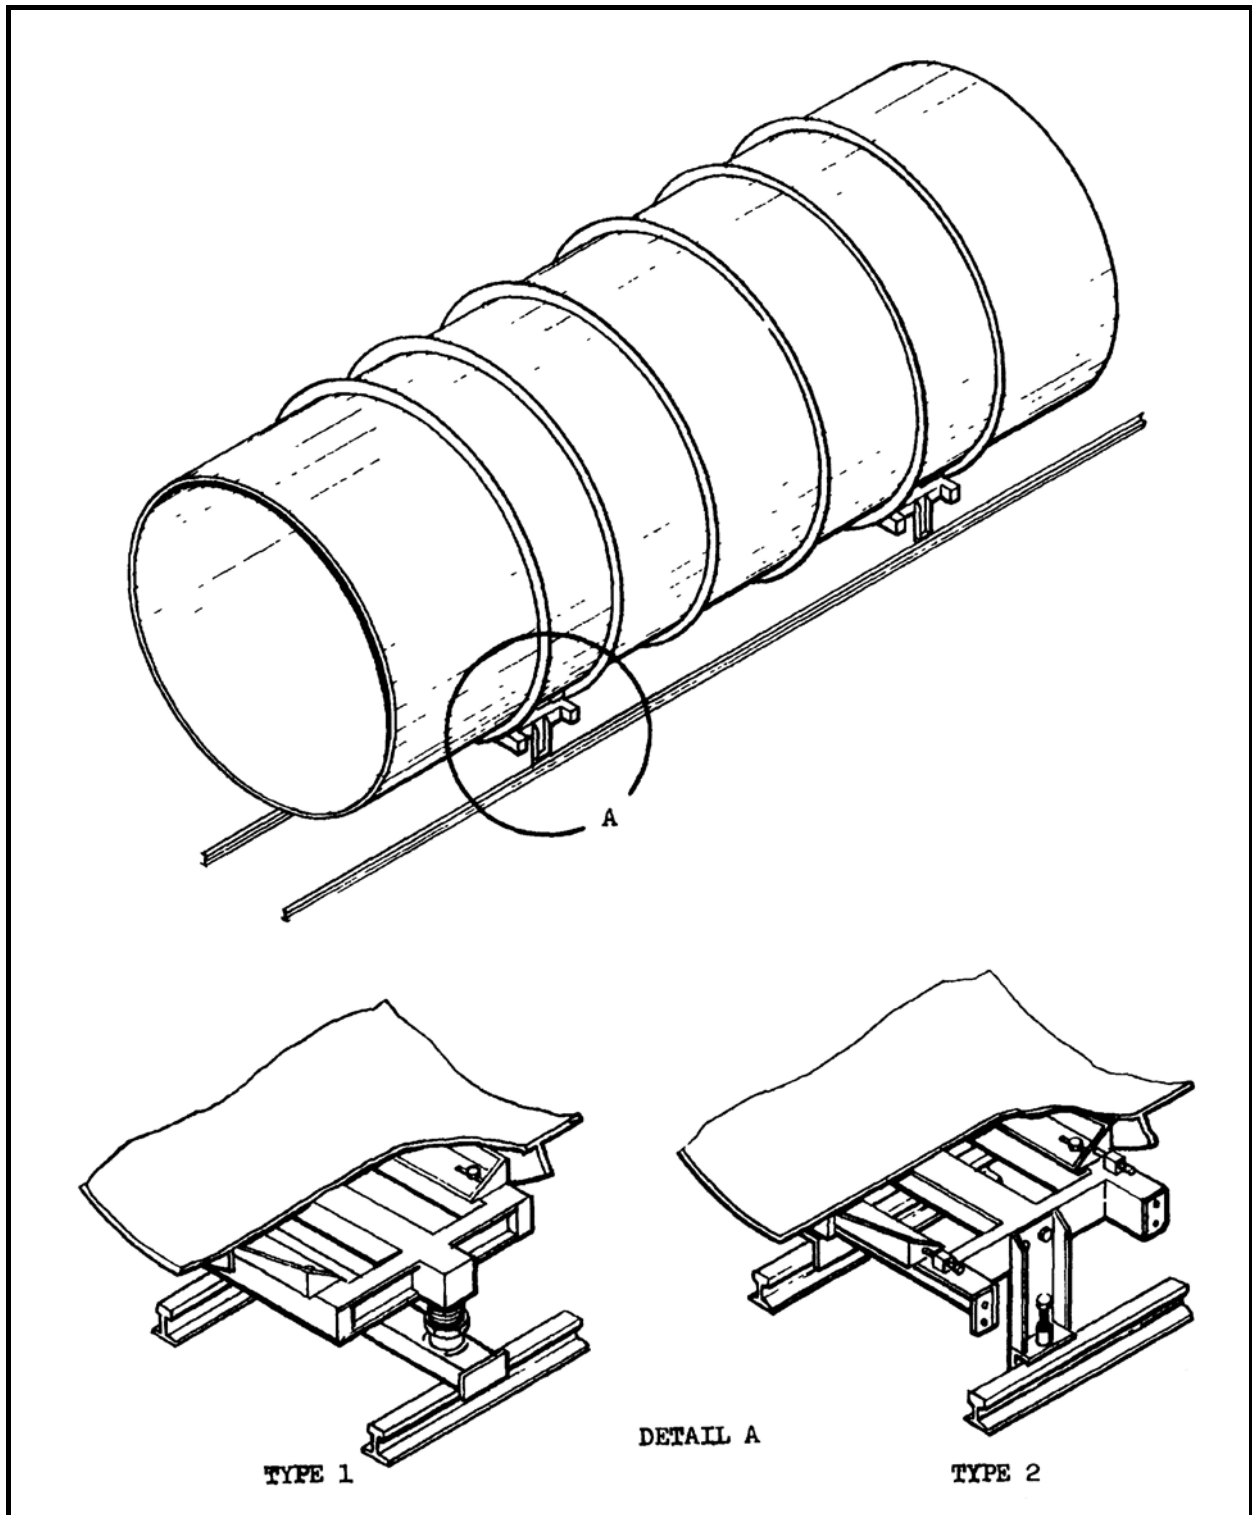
Sketch of a conical line-of-sight pipe section and supports (Carpenter 1971). Note the use of the tunnel rail system for attaching and aligning the pipe supports.
